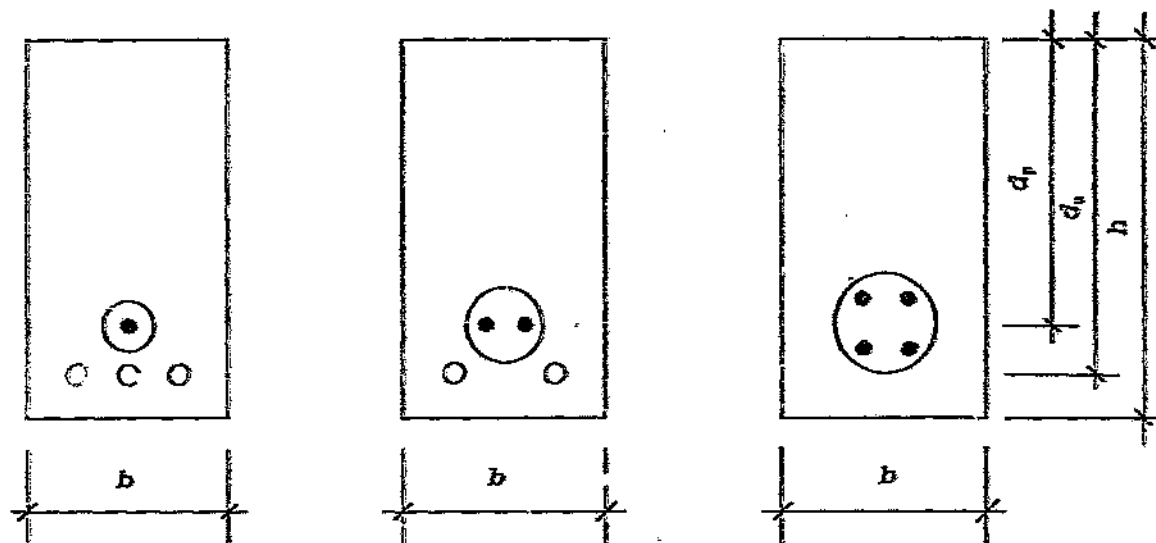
(b) Sections of the test beams from series B (post tensioned unbonded strands and deformed bars)
